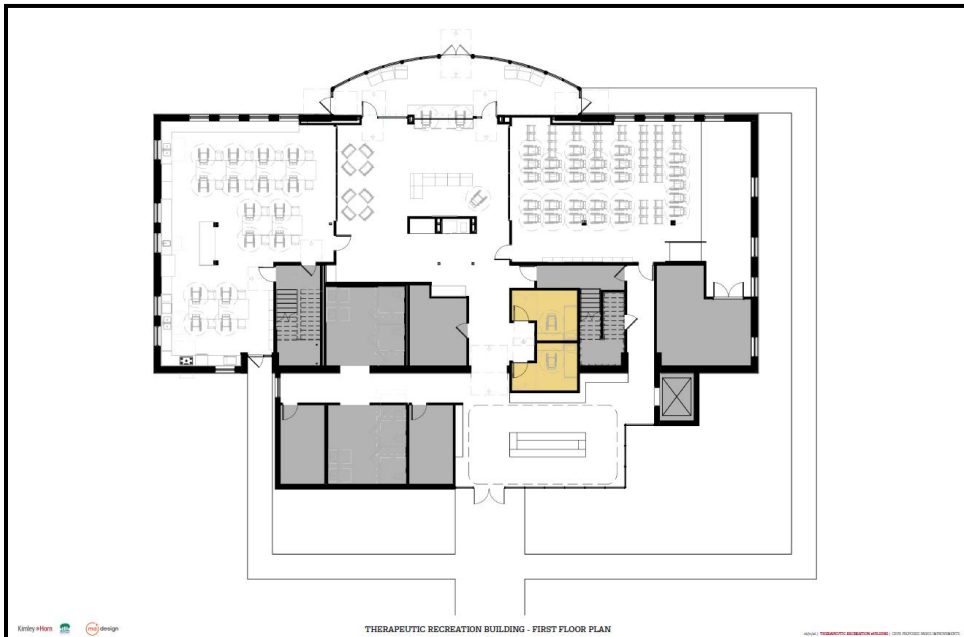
McCoy Park Phase II Therapeutic Recreation Facility Preliminary Floor Plan. This preliminary floor plan illustrates the conceptual interior layout for the planned therapeutic recreation facility at McCoy Park. A larger version of this floor plan is provided in Attachment G.
